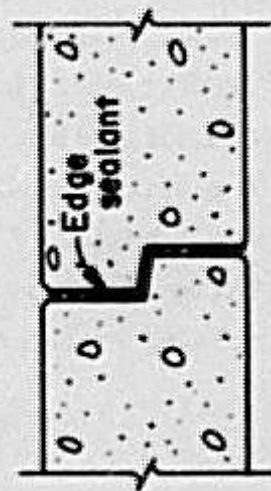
LEXINGTON MARKET TUNNEL SEGMENT
